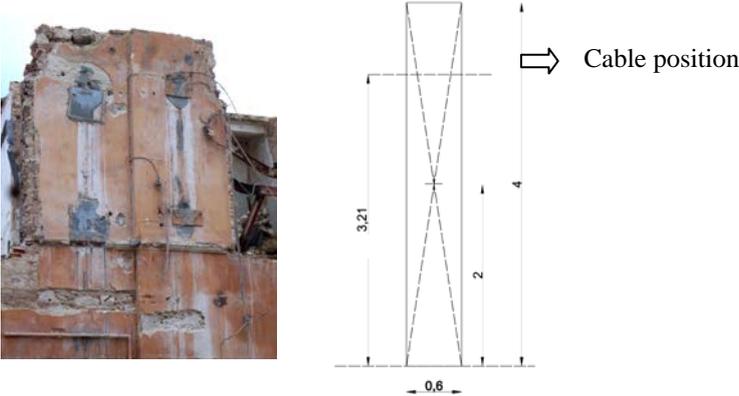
Panel n. 2 –Cable position and panel n.2 geometrical dimensions
